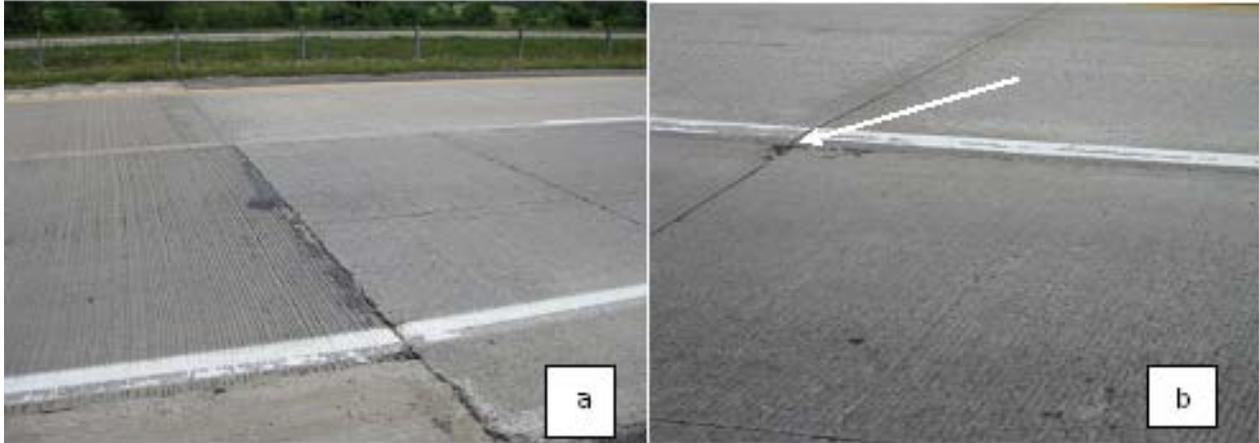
Photo a showing the start of the overlay at north end. Photo b shows typical joint raveling seen.
